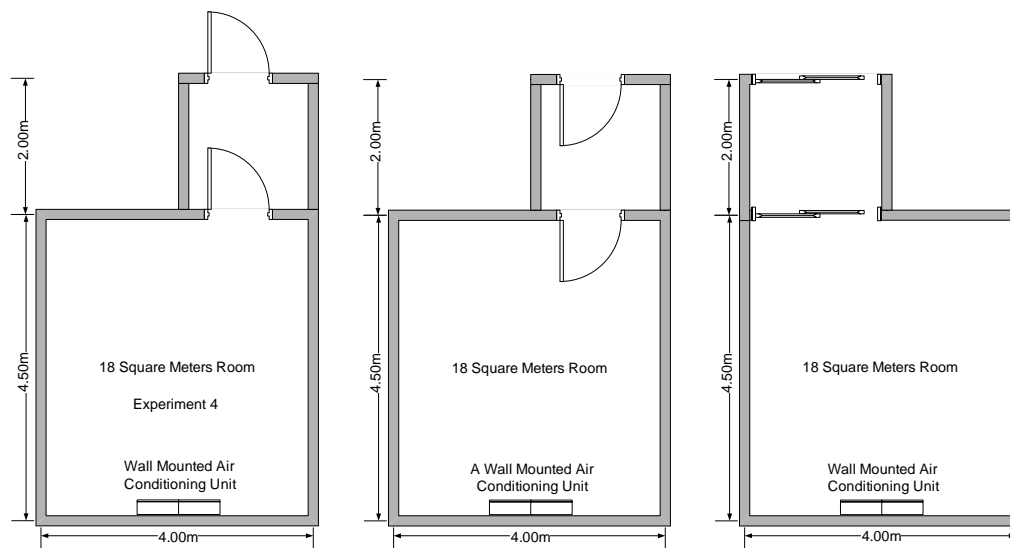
Floor Plan of Experiments 4 – 6: A Double Parallel Door
